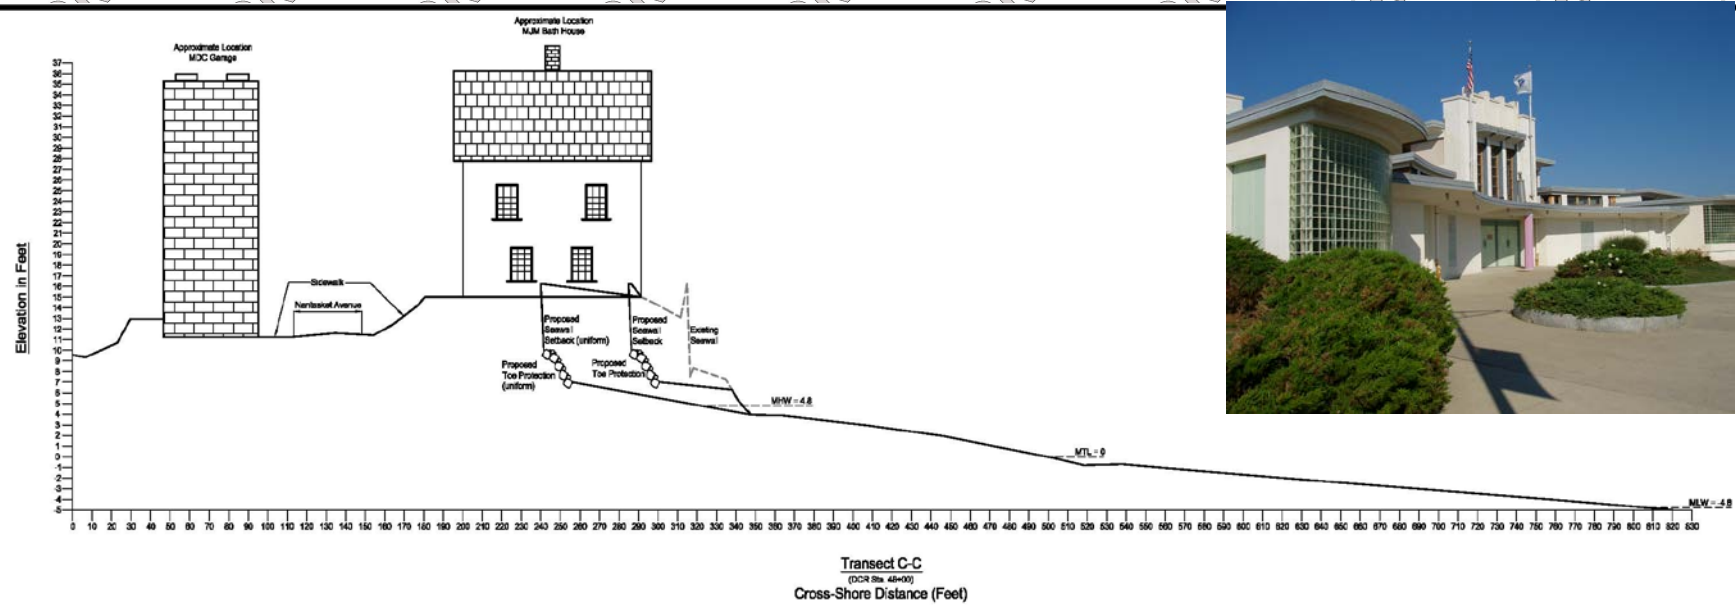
Conceptual layout of the new seawall and impact on the MJM bathhouse for Alternative 7 (conceptual layout only, not to scale).
